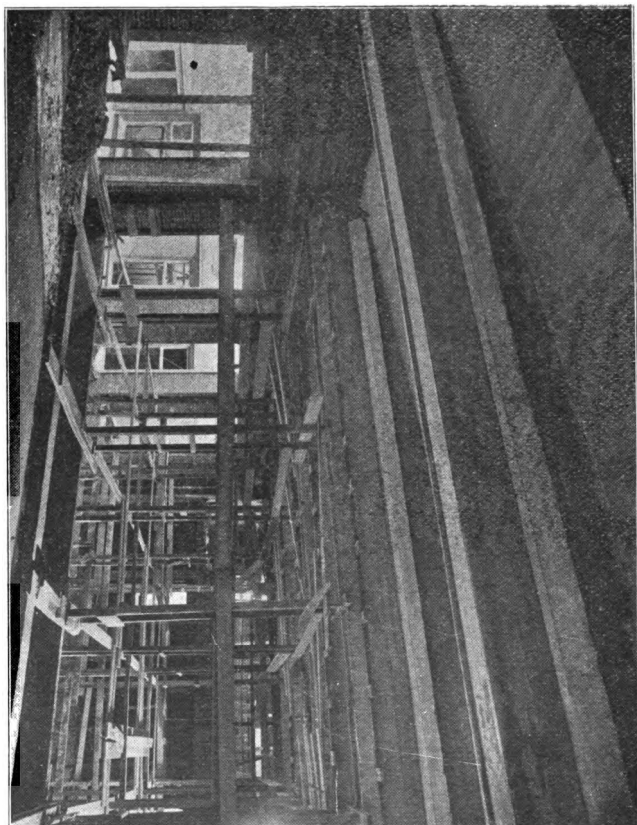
Roof and Balcony Girders of 50 ft. Span, Auditorium
